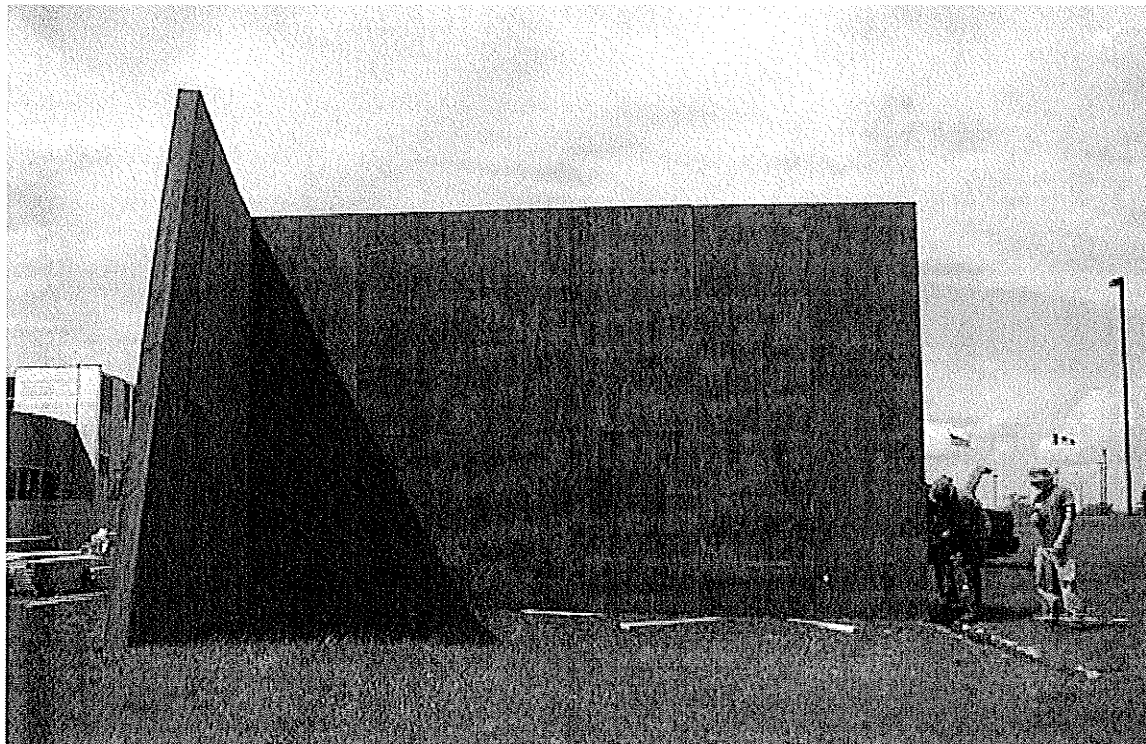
North and West Wall Panels erected and placed in Trench (view to the North).
